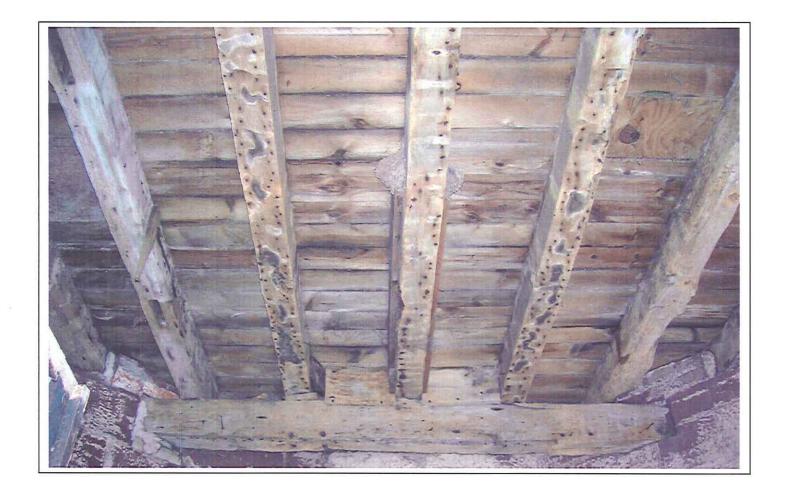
View of the ground-floor ceiling beams with the bressummer to the east
